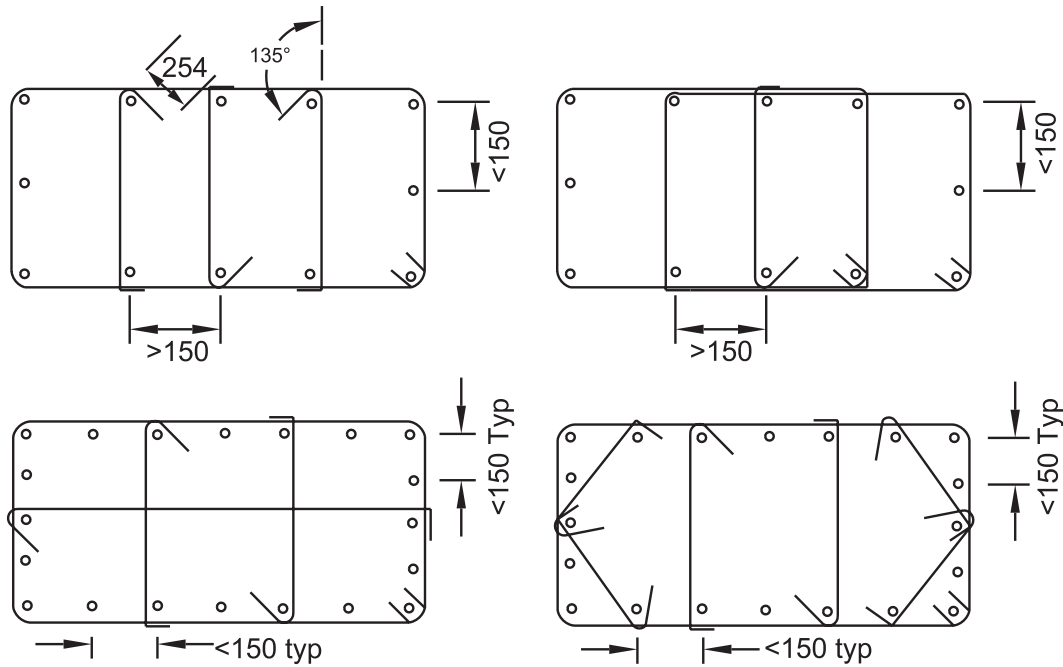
Alternate methods for detailing of transverse reinforcements in columns/piers (dimensions in mm).
